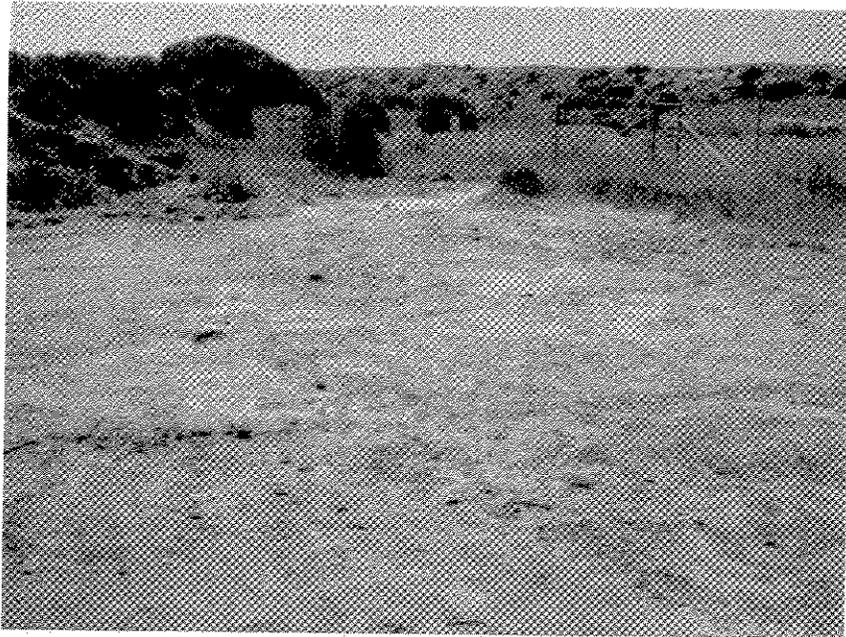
EW002 After Cysts-Bearing Soil Removal
